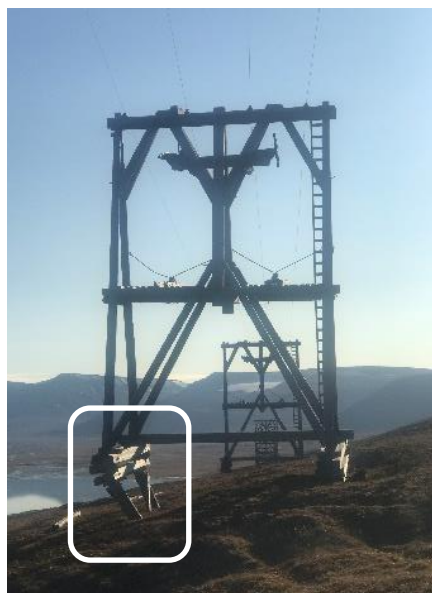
Broken cross-bracing element at cableway trestle Nr. 36 at the Line 6 (close look-up).
